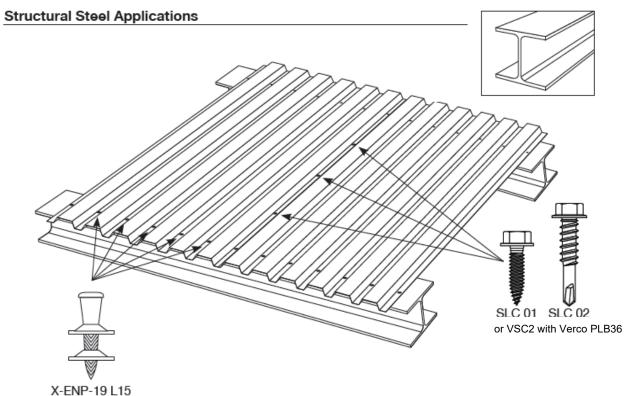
HILTI DECK FASTENER INSTALLATION OVERVIEW
